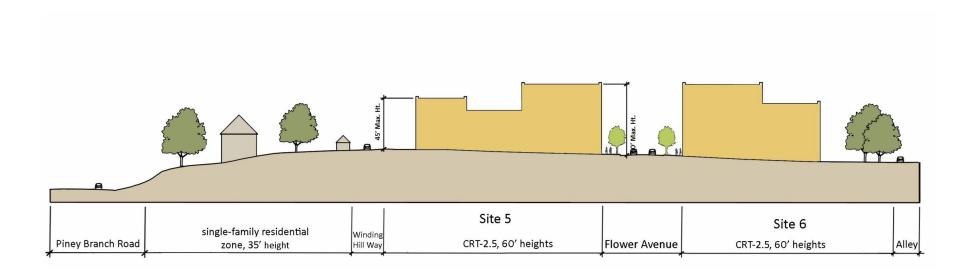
Sites 5, 6, and Greenwood Avenue Cross Section
